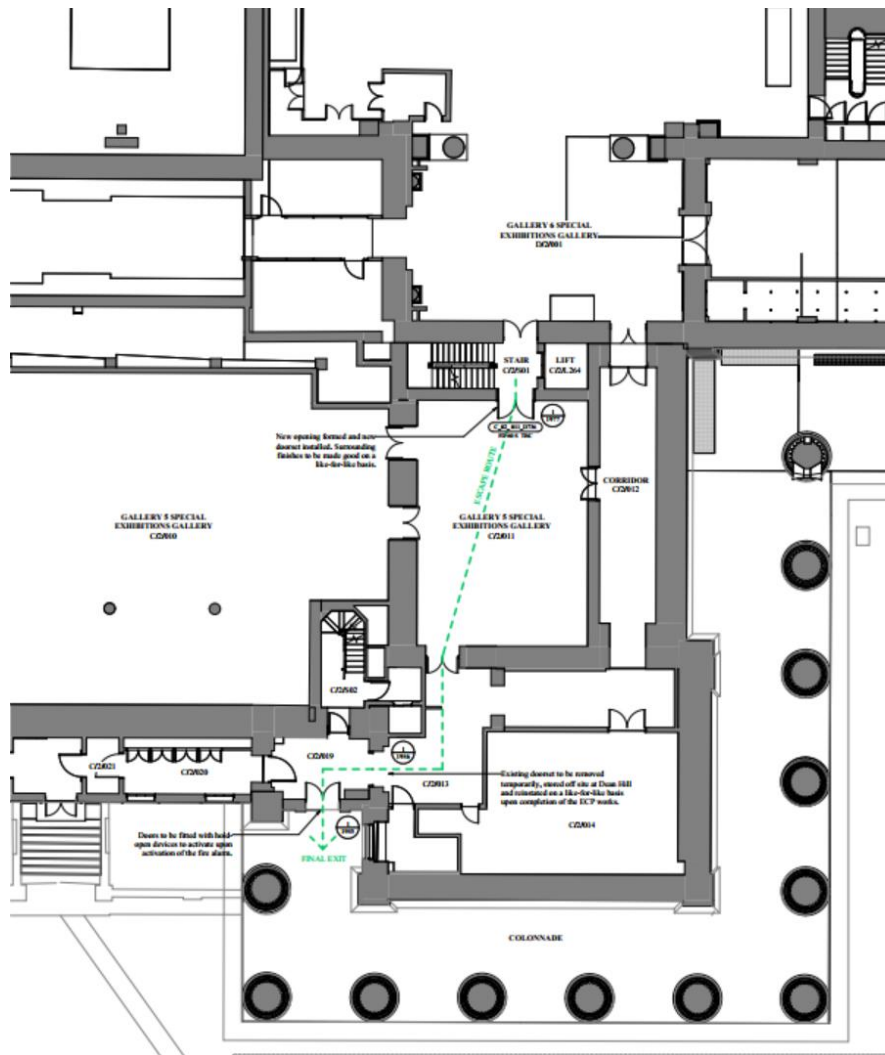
Floor Plan indicating the location of the Proposed means of escape route.
